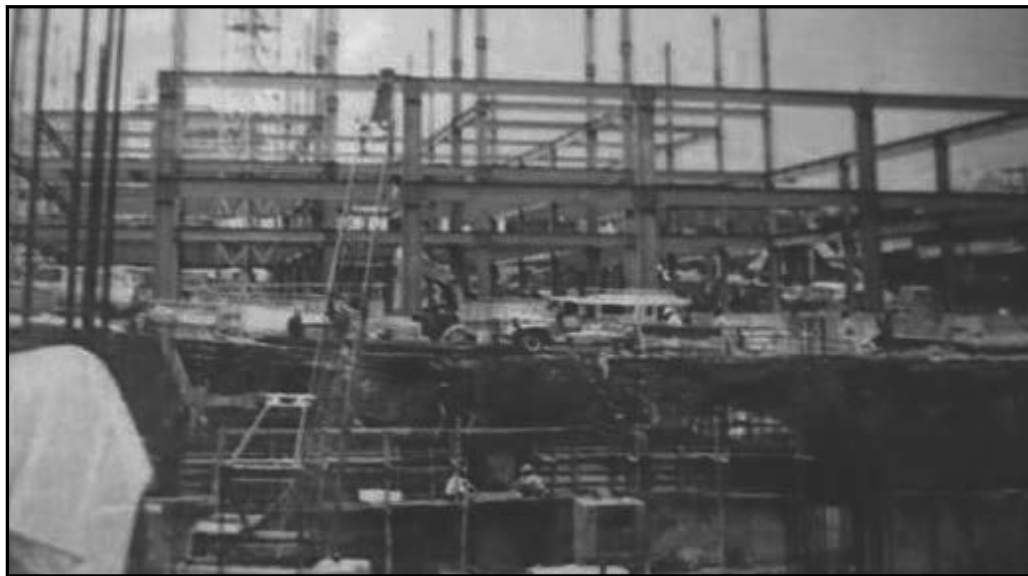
View of ongoing construction with provision for underground parking via Kalayaan St. (*Photo from Kagitingan Brgy. office photograph*).
